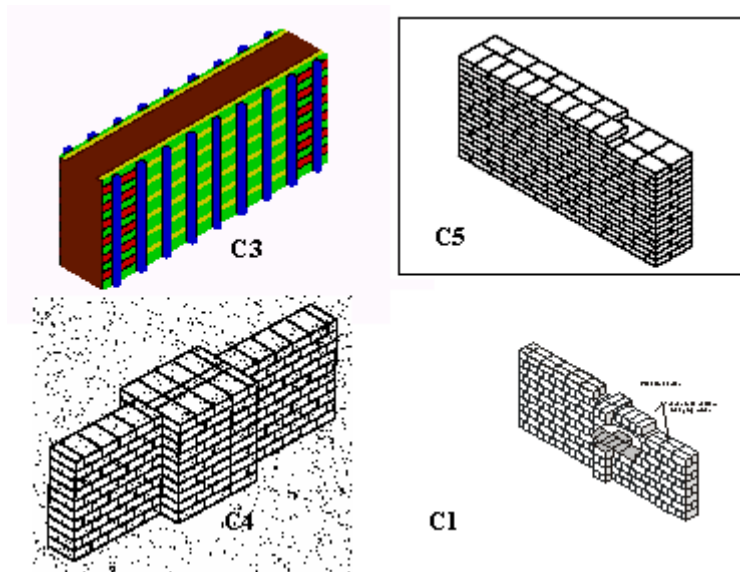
Various types of seal designs tested in the new chambers. C 1 - standard-solid-block seal design; C 4 - 0.6-m thick Omega block design with 1.8-m by 1.4-m deep pilaster; C 3- 1.2-m thick plug seal design; C 5 - 1-m thick Omega block design.
